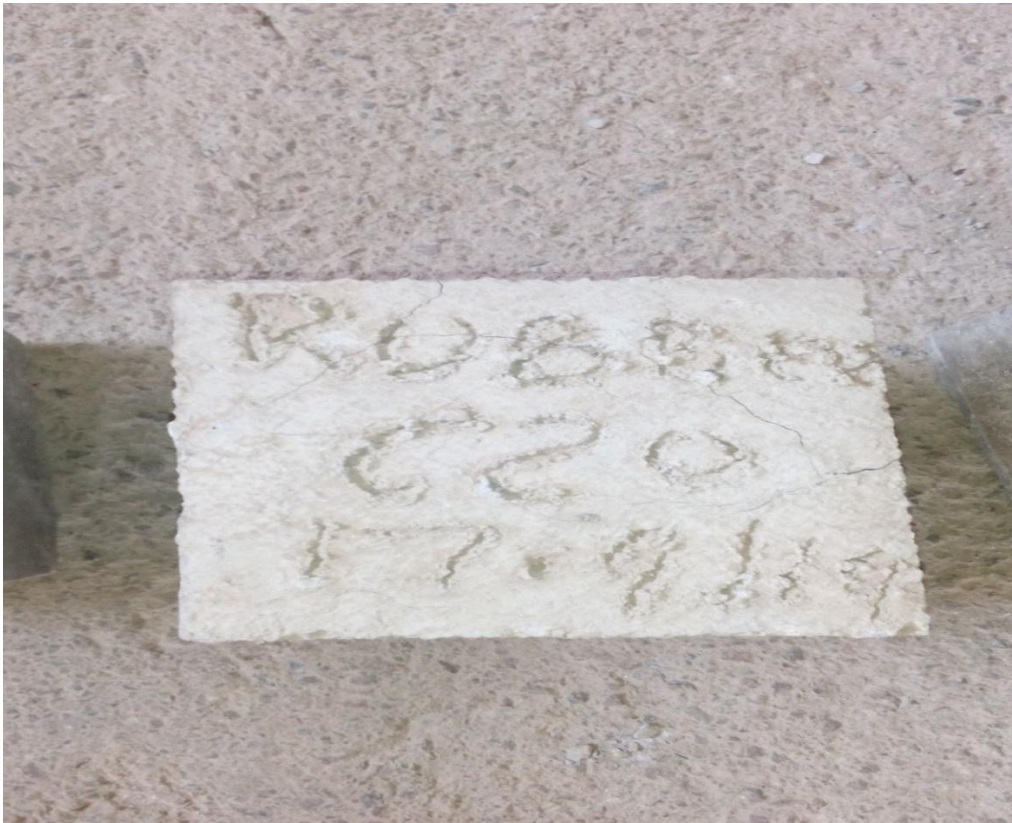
Rubber reinforced concrete exhibiting some cracks after being subjected to heat at 100 ° C for 48 hours
